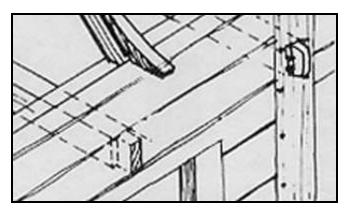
Ceiling joists. One joist is left flush within a horizontal wall timber and the other protrudes through a coulisse and is secured with a cheville (Lessard and Vilandré 1974: 209).
